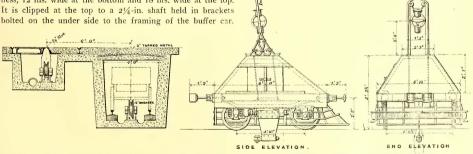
CROSS SECTION OF TRACK, SHOWING SHEAVES
